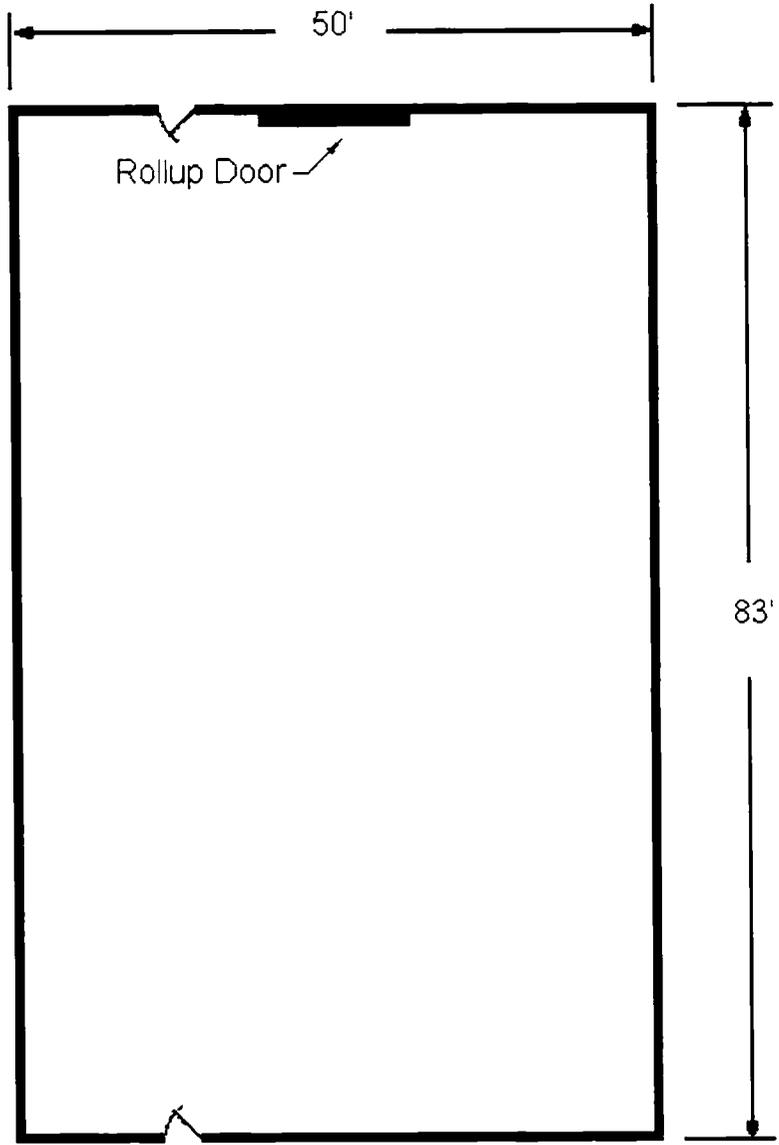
NFS TRU Storage Facility. Building 7574.
